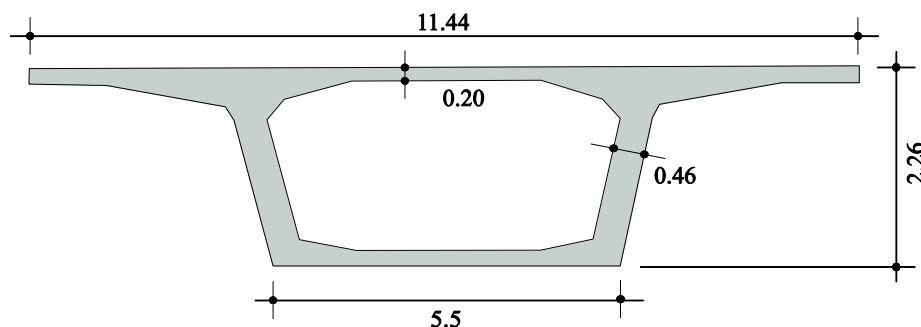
Typical cross-section of precast segment [Muller 1985]
